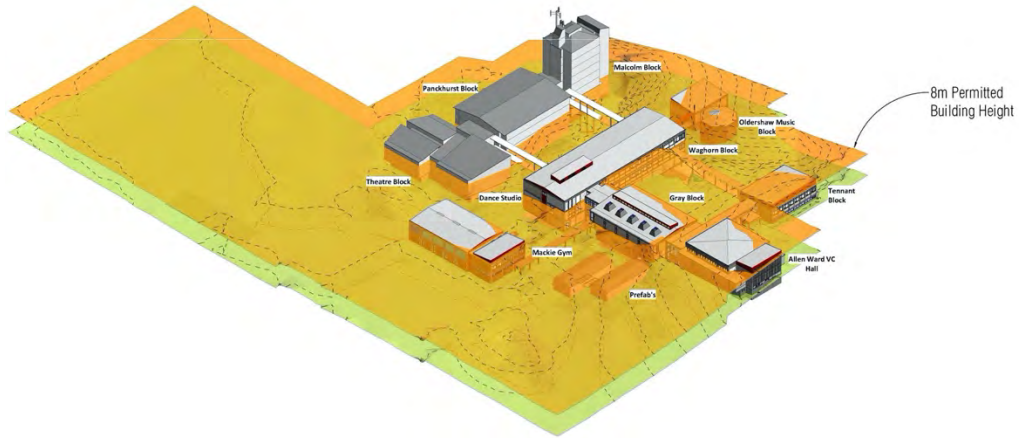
Existing Building Heights 3D (Ryman Drawing RCA09 ..A0-40).
